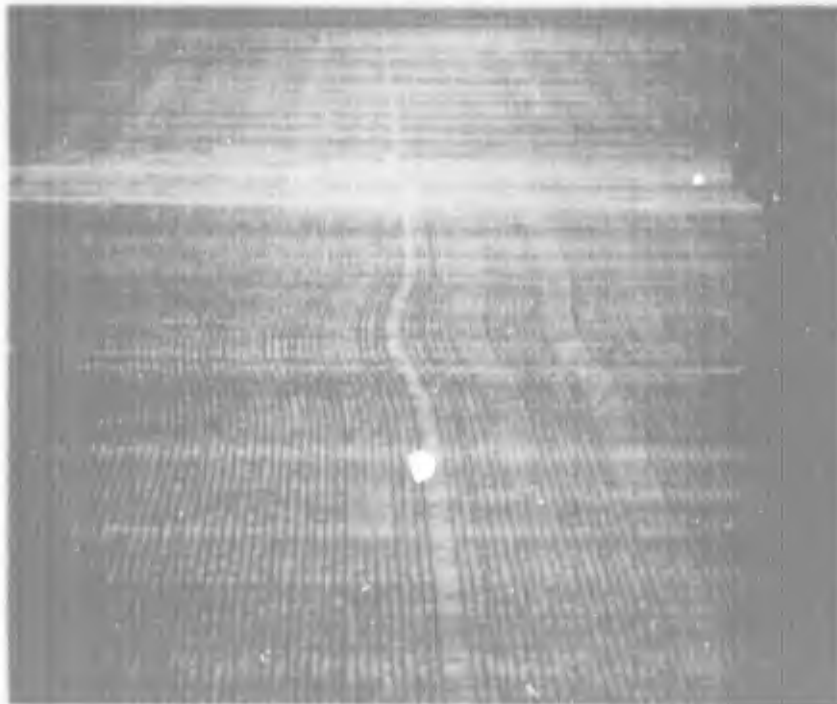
Shifting of pavement surface in touchdown area near south end of runway
